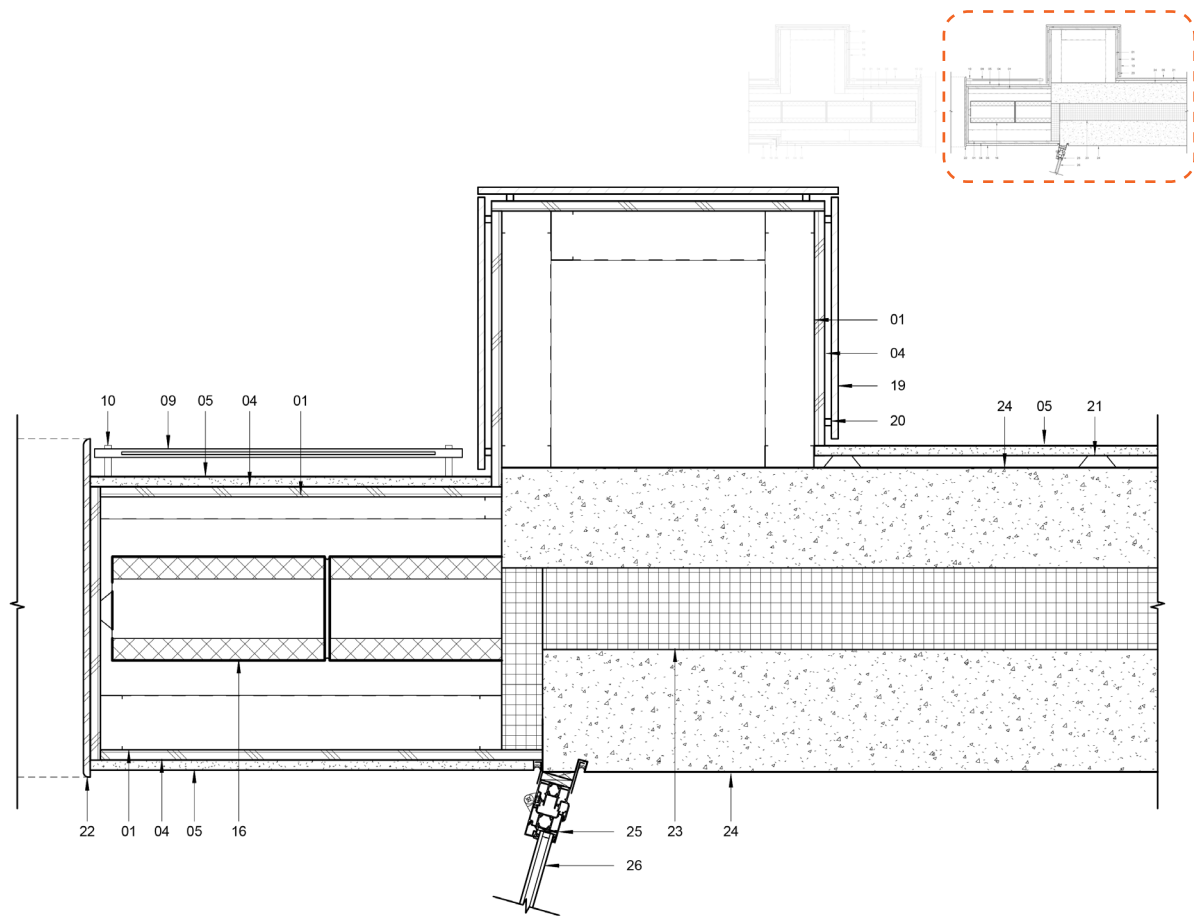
Penny Wall Detail Section @ Ground Floor
